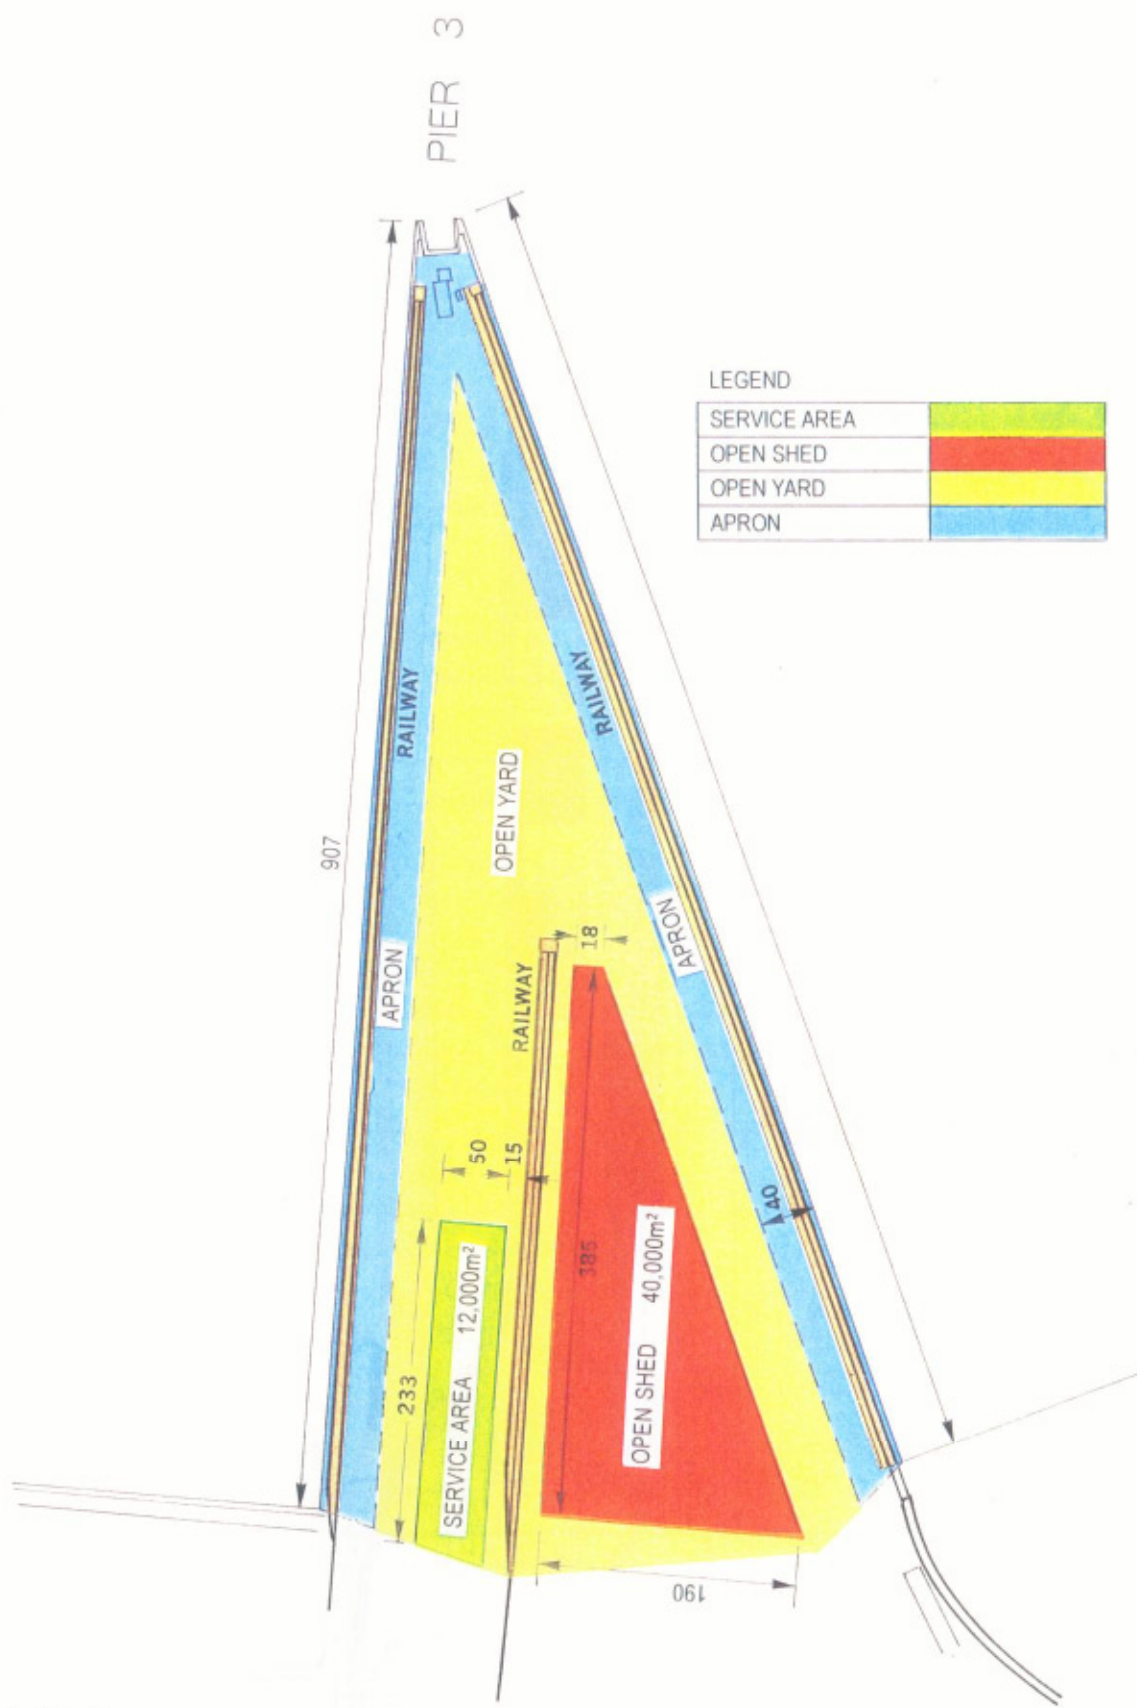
Master Plan Layout (Case-1, 2020, Layout Plan-A)
